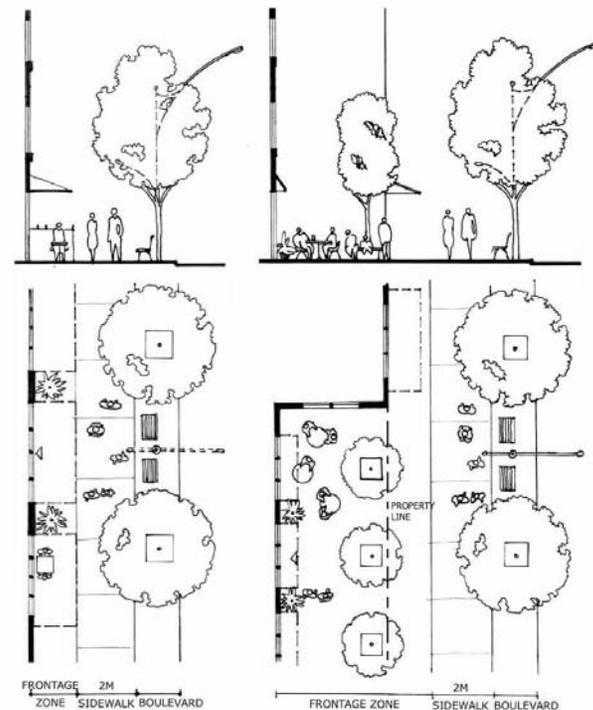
Streetscape section and plan showing the boulevard, sidewalk and area for retail amenity (frontage zone).
